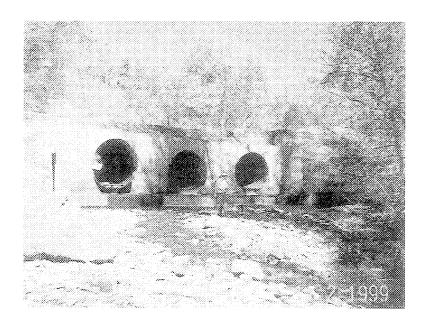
Featherville culverts prior to rock structure construction in November 1999.
